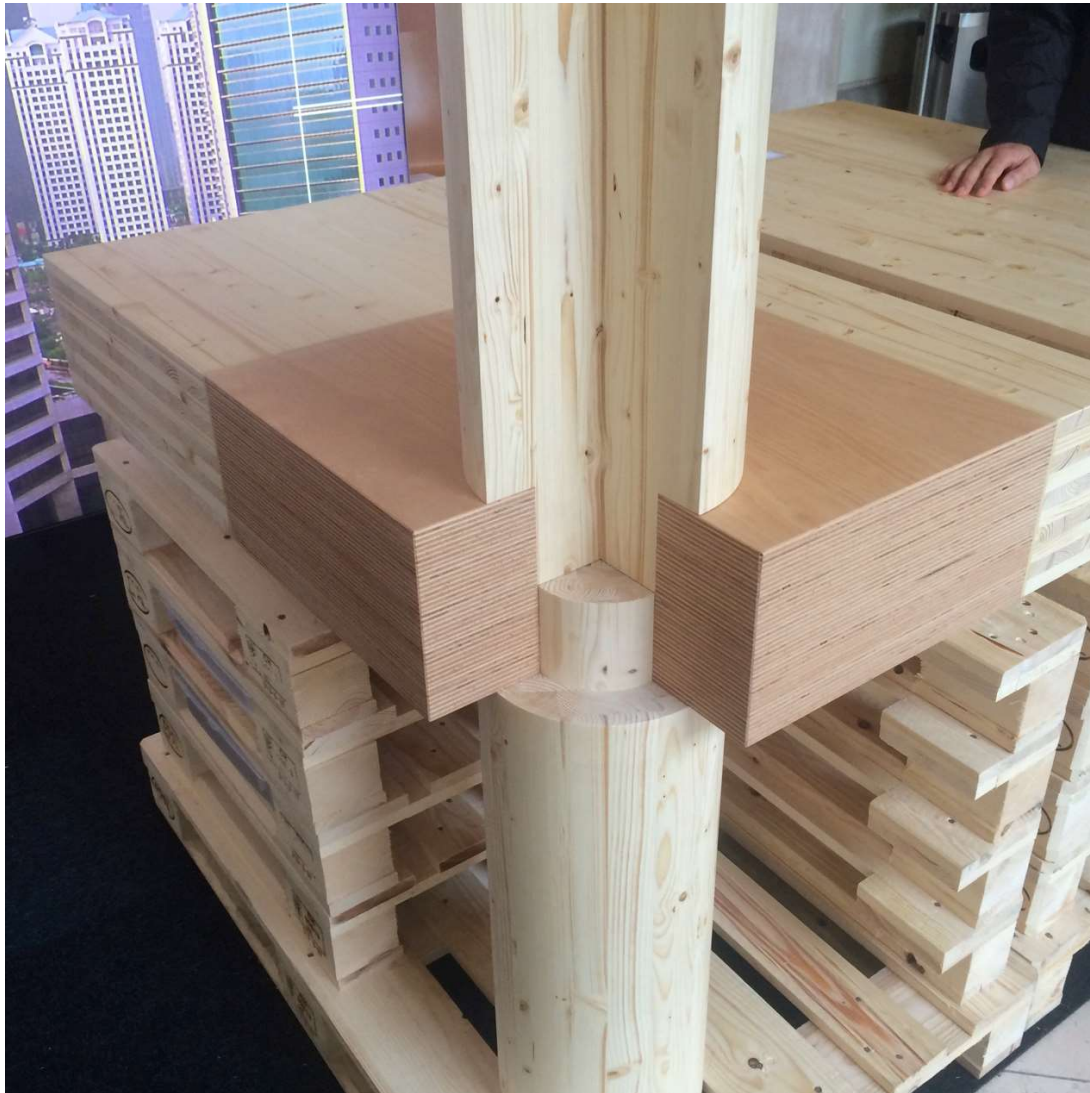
Model of Timbatec’s adventurous TS3 structural column and floor plate concept for multi-storey buildings (Note: pallets beneath the floor plate are for exhibiting purposes only)
